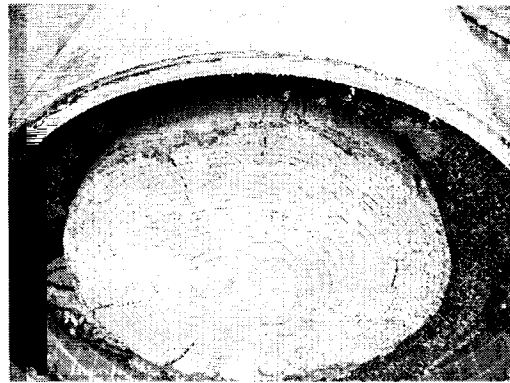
Failure at the Interface between Wood Pile and Cement-Based Grout
